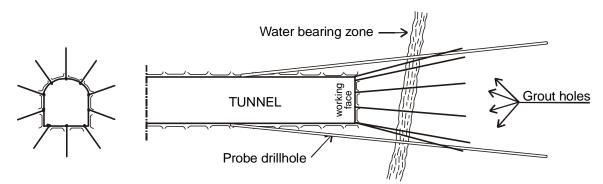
Probe drilling and re-grouting for subsea tunnelling.
